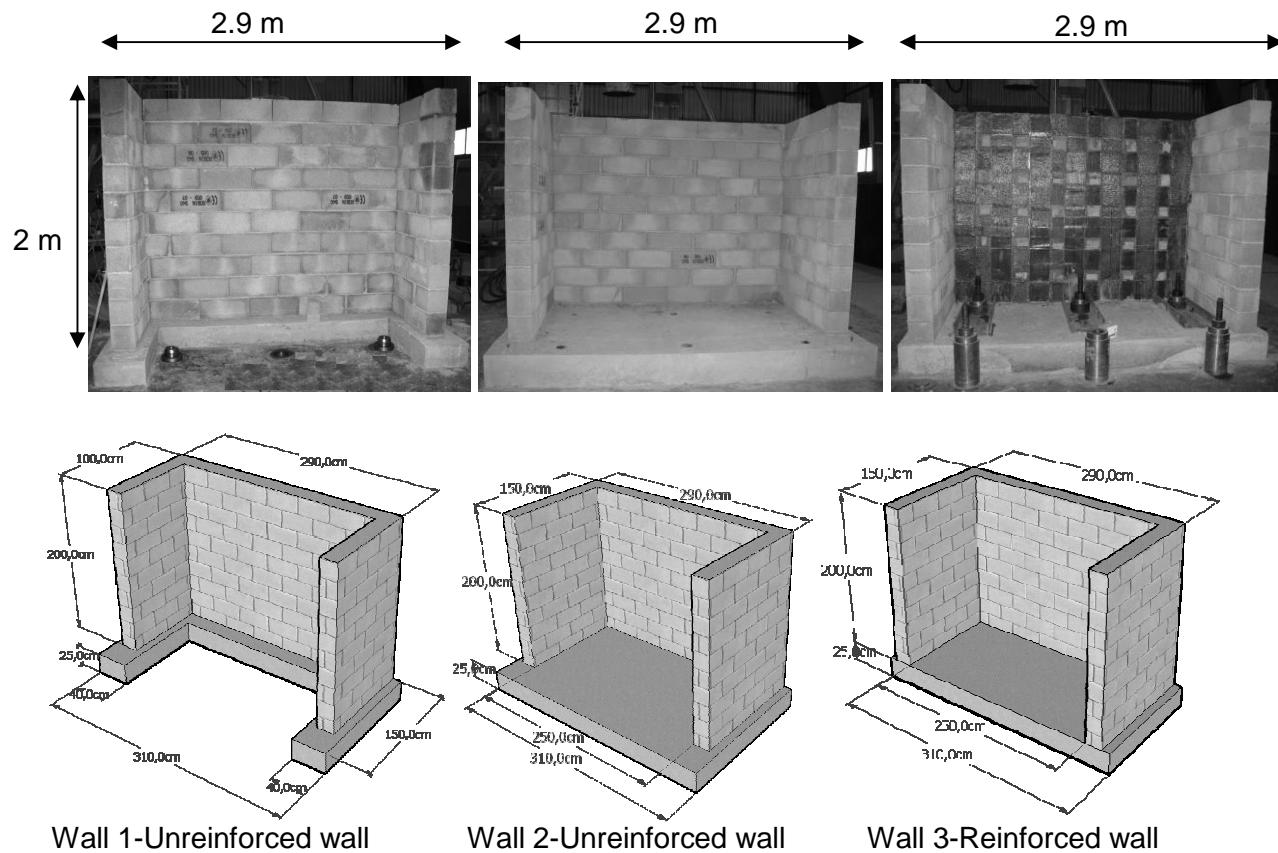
Unreinforced (wall 1 & 2) and reinforced masonry wall (wall 3). Specimens 1, 2 and 3
